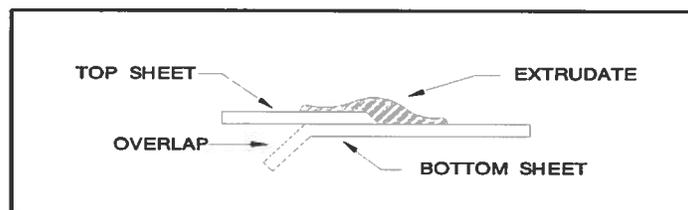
Fillet-Extruded Geomembrane Weld
